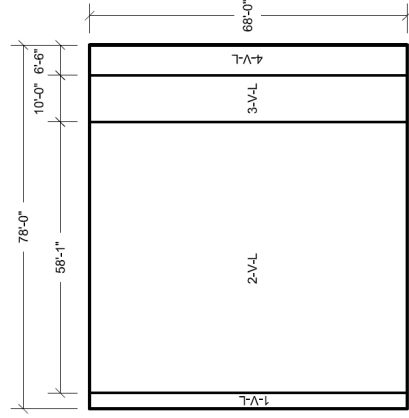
H.6-58: PUMP HOUSE WEST WALL LOOKING EAST
